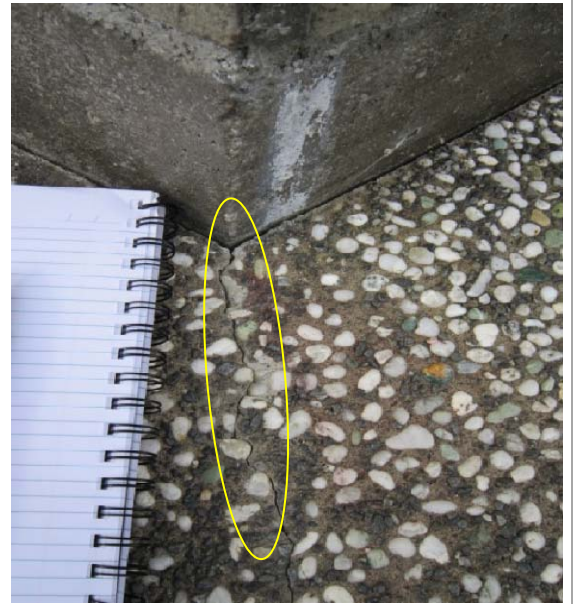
Separation of footpaths from the structure along joint lines and cracking from structural corners
